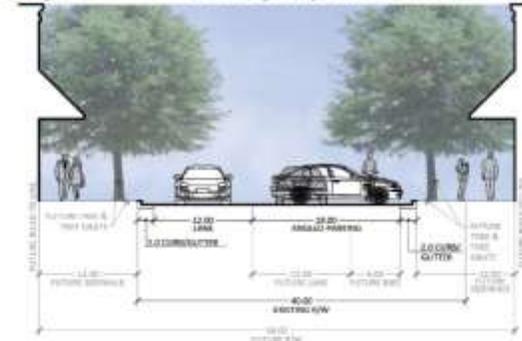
B: Right-of-Way with Existing Structures Setback (e.g., Park Street, Penn Street)
